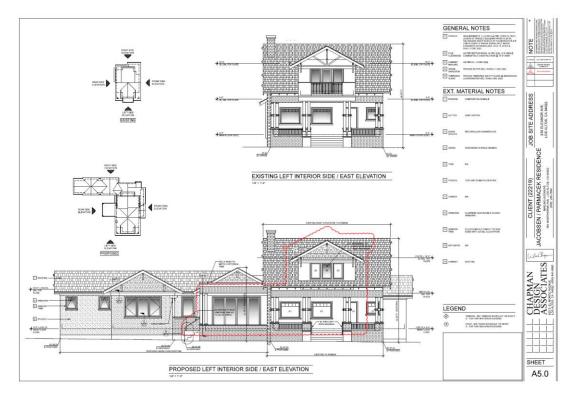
Sheet A5.0 shows the proposed removal of the balcony and the new fenestration (Chapman Design Associates, 10/17/2024).
